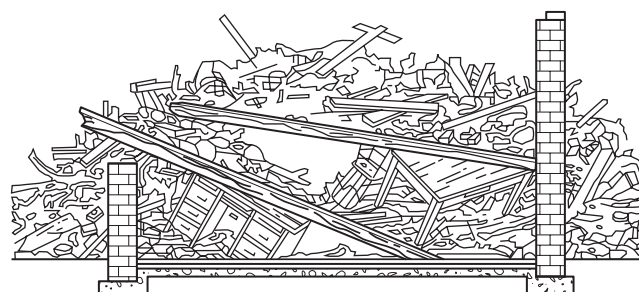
(c) Pancake Floor Collapse. (Courtesy of U.S. Department of Civil Defense)
